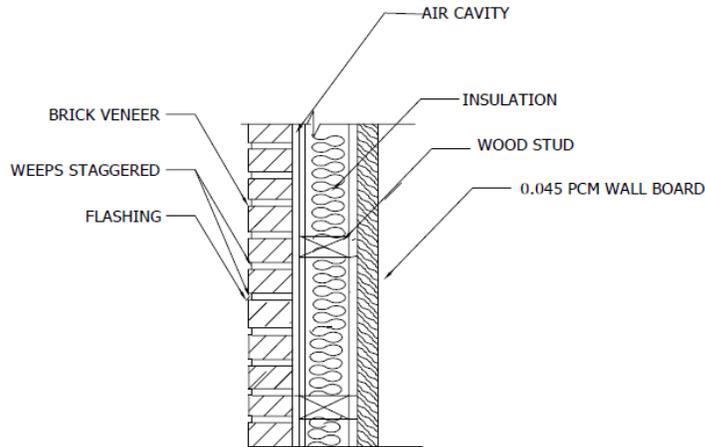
Details of wall assembly with 0.045 m PCM wall board.
